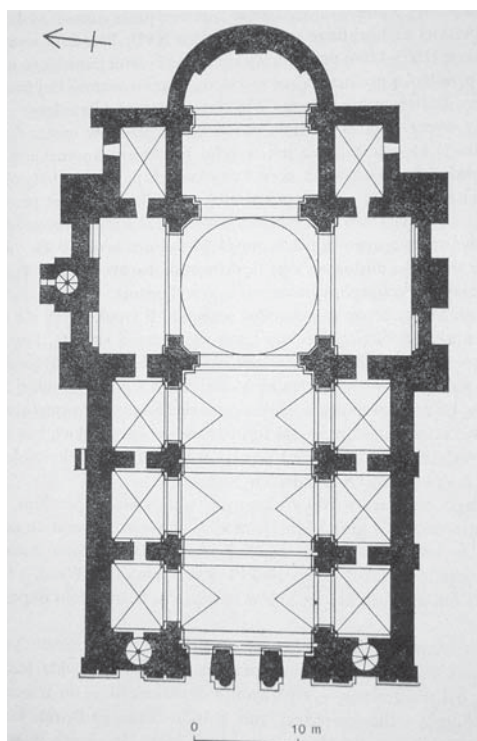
St. Peter and St Paul church in Kraków. Plan.
